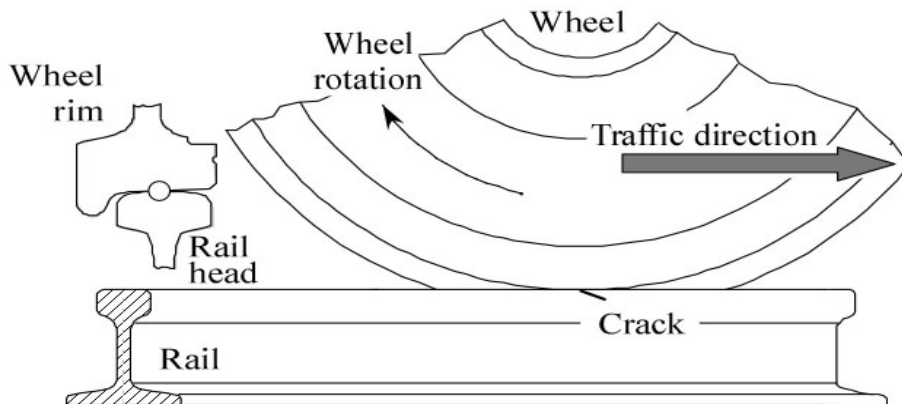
A wheel rolling on a continuously welded rail
